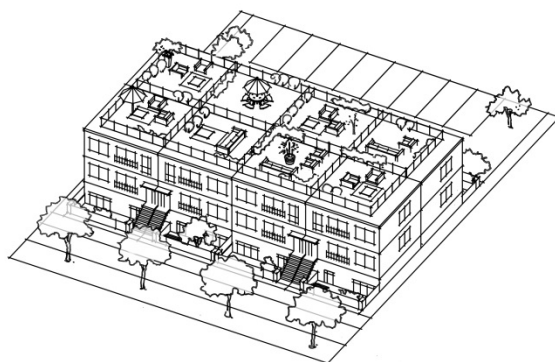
Illustration of courtyard arrangement of stacked townhouses or rowhouses
